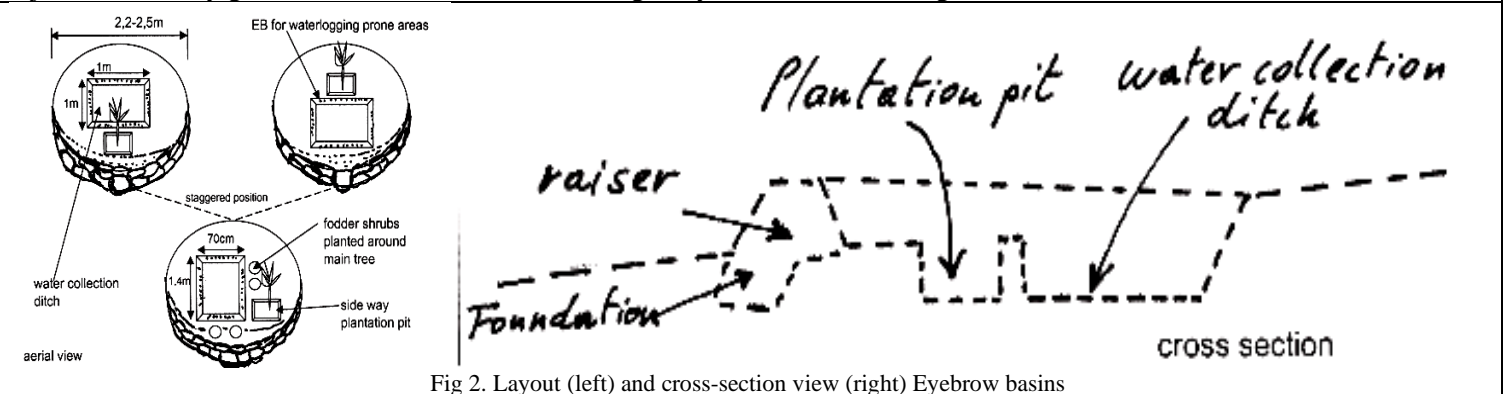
Layout (left) and cross-section view (right) Eye-brow basins
